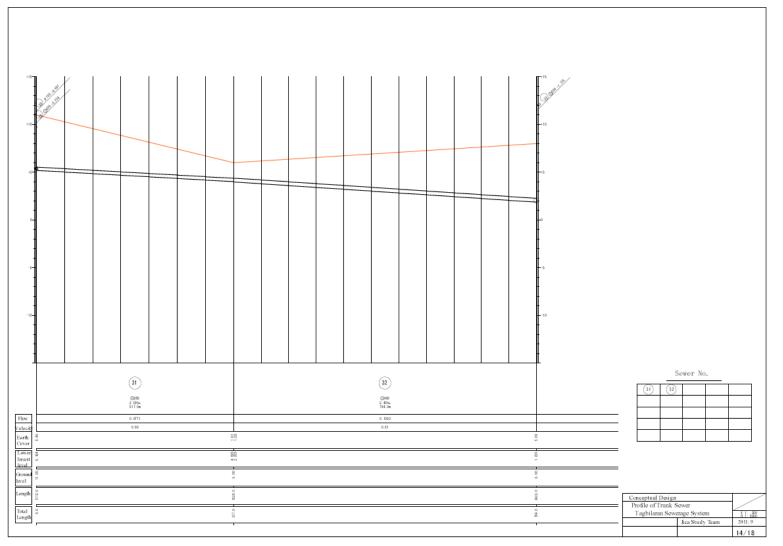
Profile of Trunk Sewer (Tagbilaran Sewerage System)
